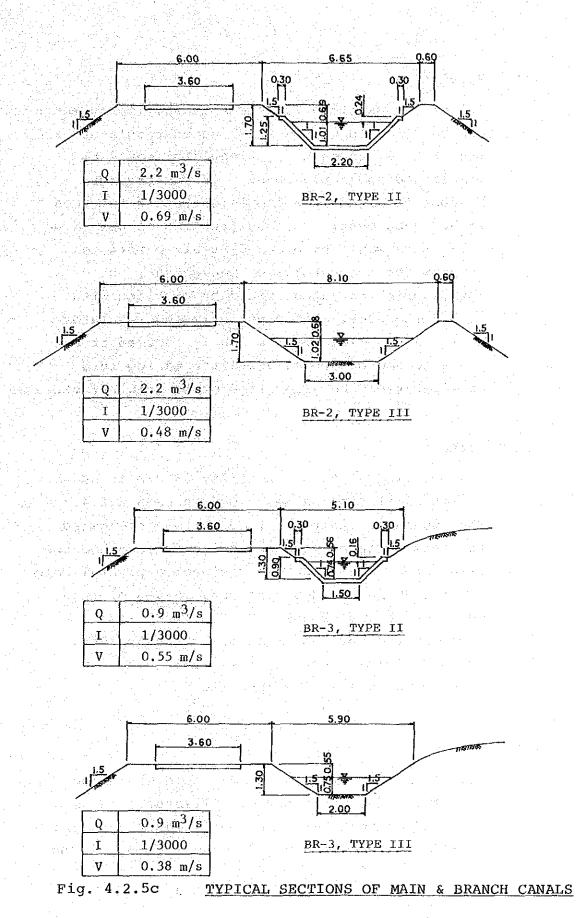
TYPICAL SECTIONS OF MAIN & BRANCH CANALS
